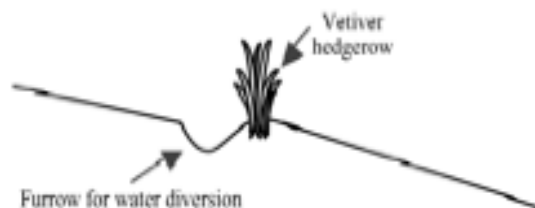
Create a small furrow and plant vetiver on top of the down-slope bump to help capture and divert runoff.
